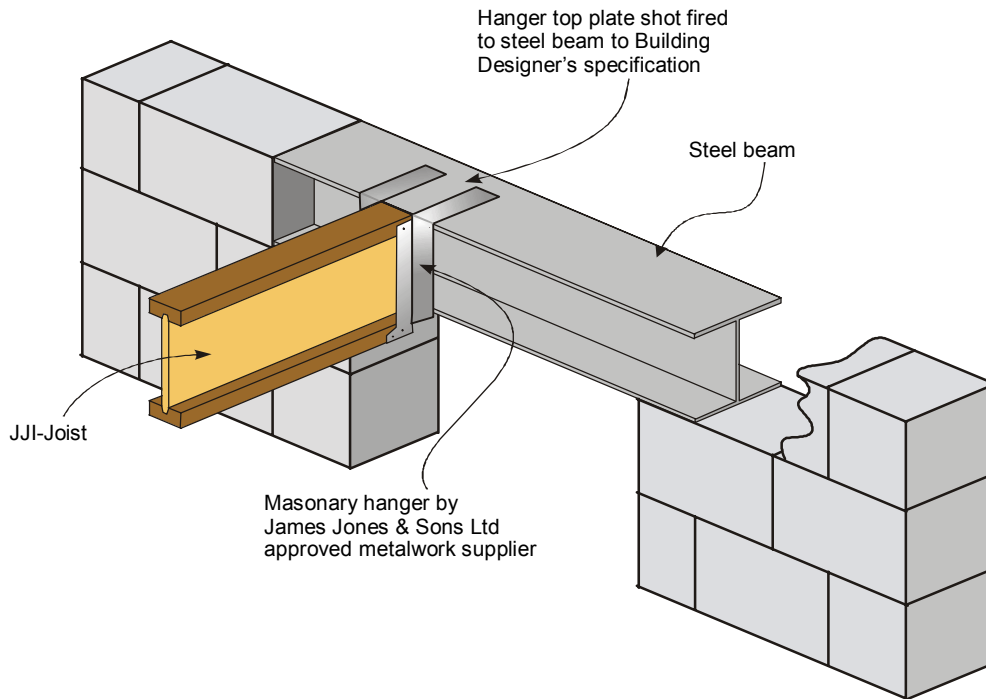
Masonry hanger to steel I-Beam connection (no blockwork above)
